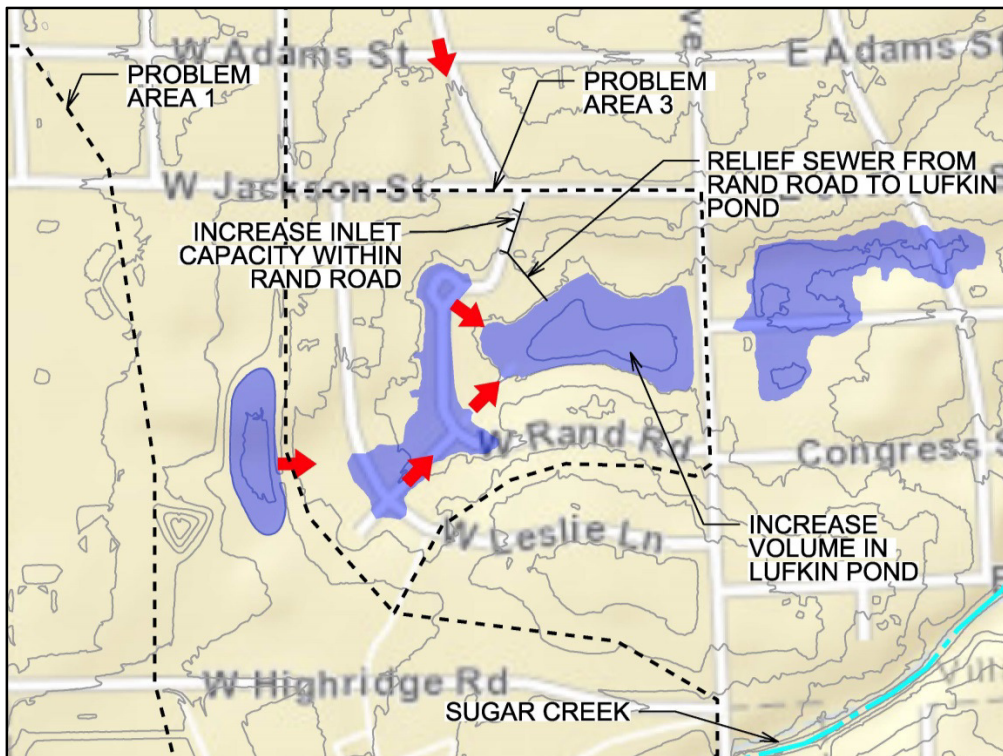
Proposed Improvements for Proposed Alternative 3b
